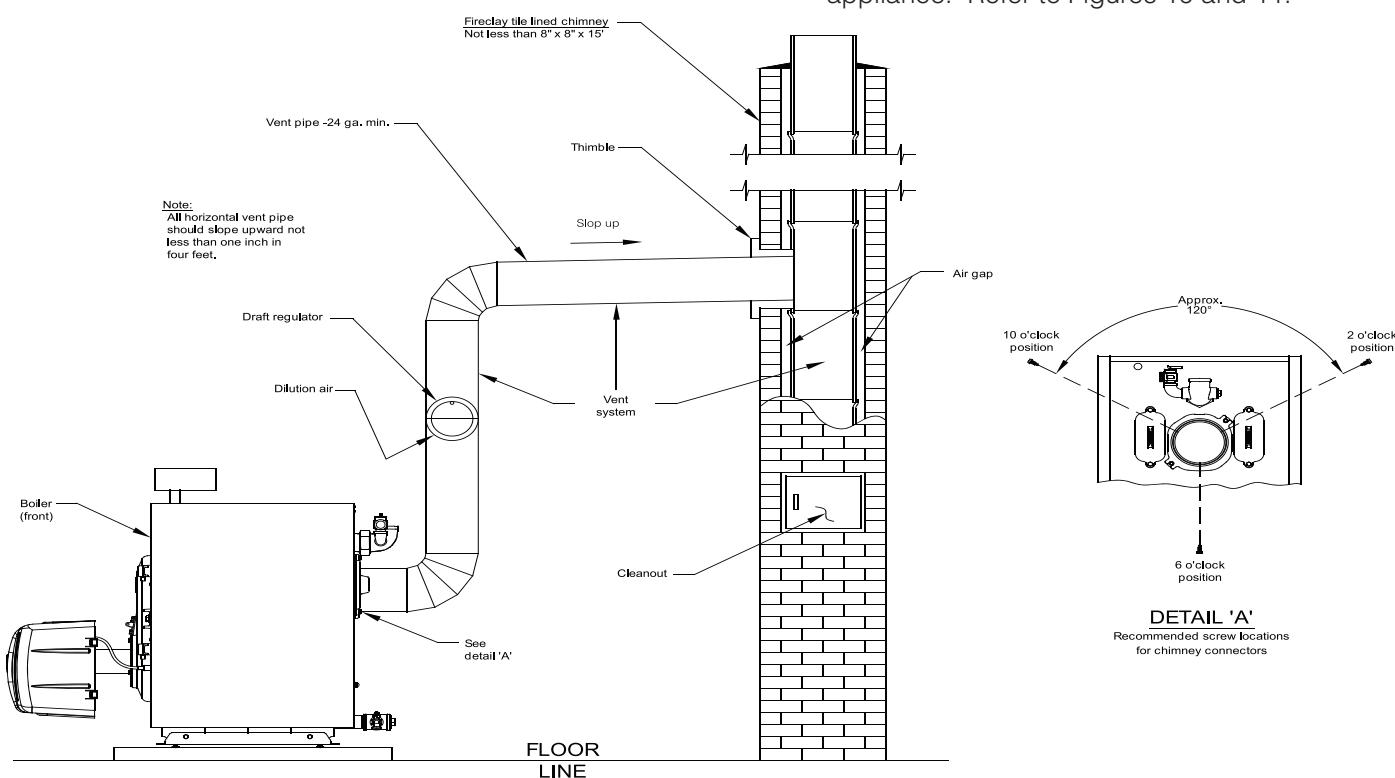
Recommended Vent Pipe Arrangement and Chimney Requirements
